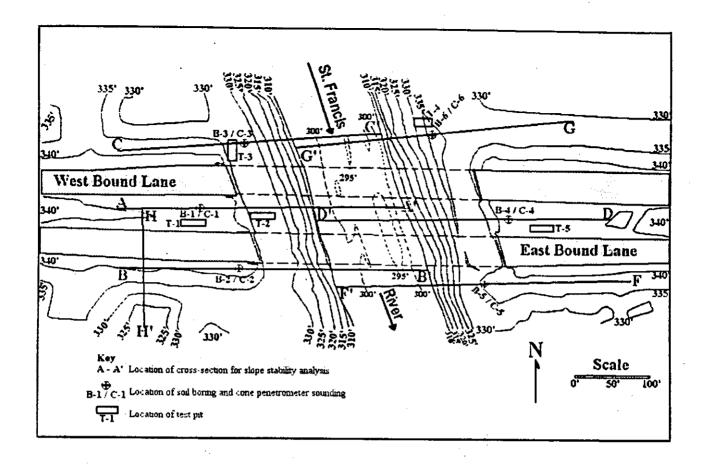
St. Francis River Site Topography, Cross-Section and Boring Locations
